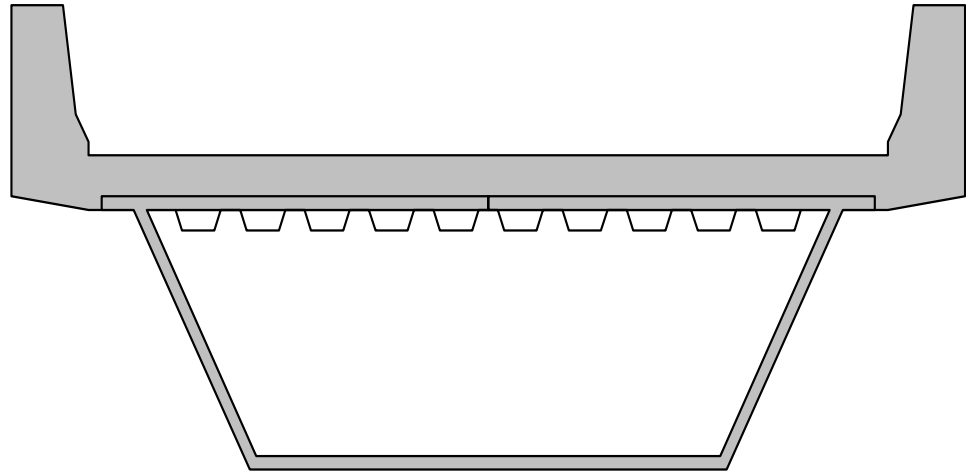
Box Girder Cross Section with Orthotropic Steel Plate Deck
